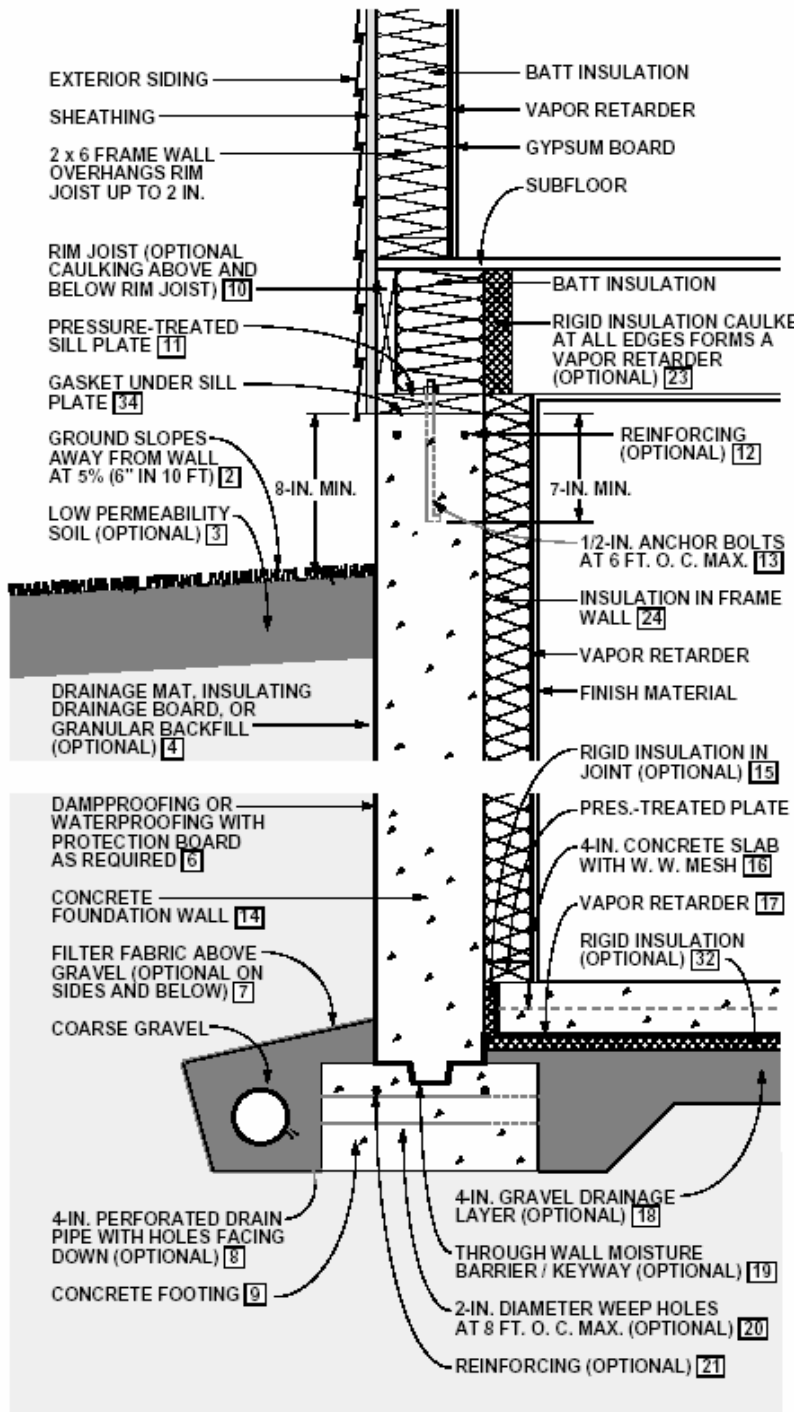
illustrates a concrete foundation wall with interior insulation. A wood frame wall is constructed inside the foundation wall and batt insulation is placed between the studs. Rigid insulation can also be placed between furring strips on the interior wall. This figure also shows rigid insulation beneath the floor slab.
